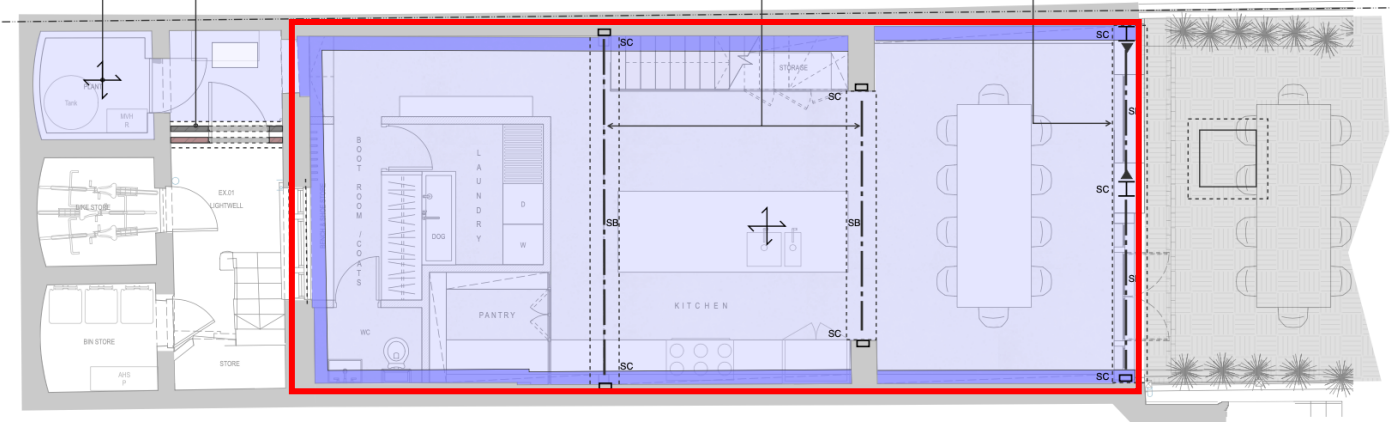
Lower ground floor general arrangement showing extent of lower ground floor to be deepened (marked in red)
